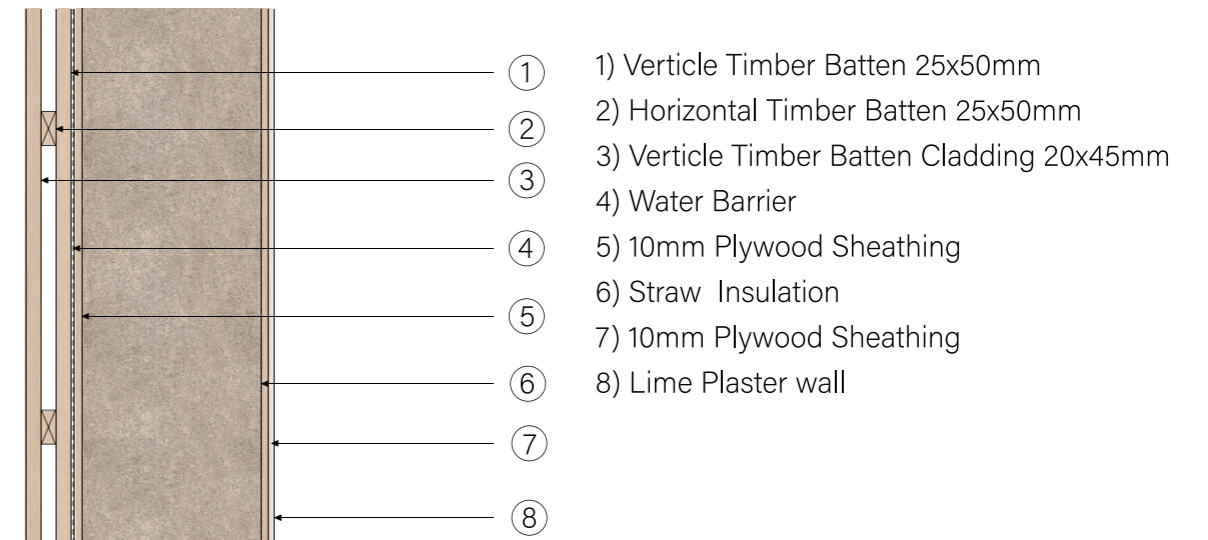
Timber Wall Detail Drawing Version Two (Scale 1:200)
